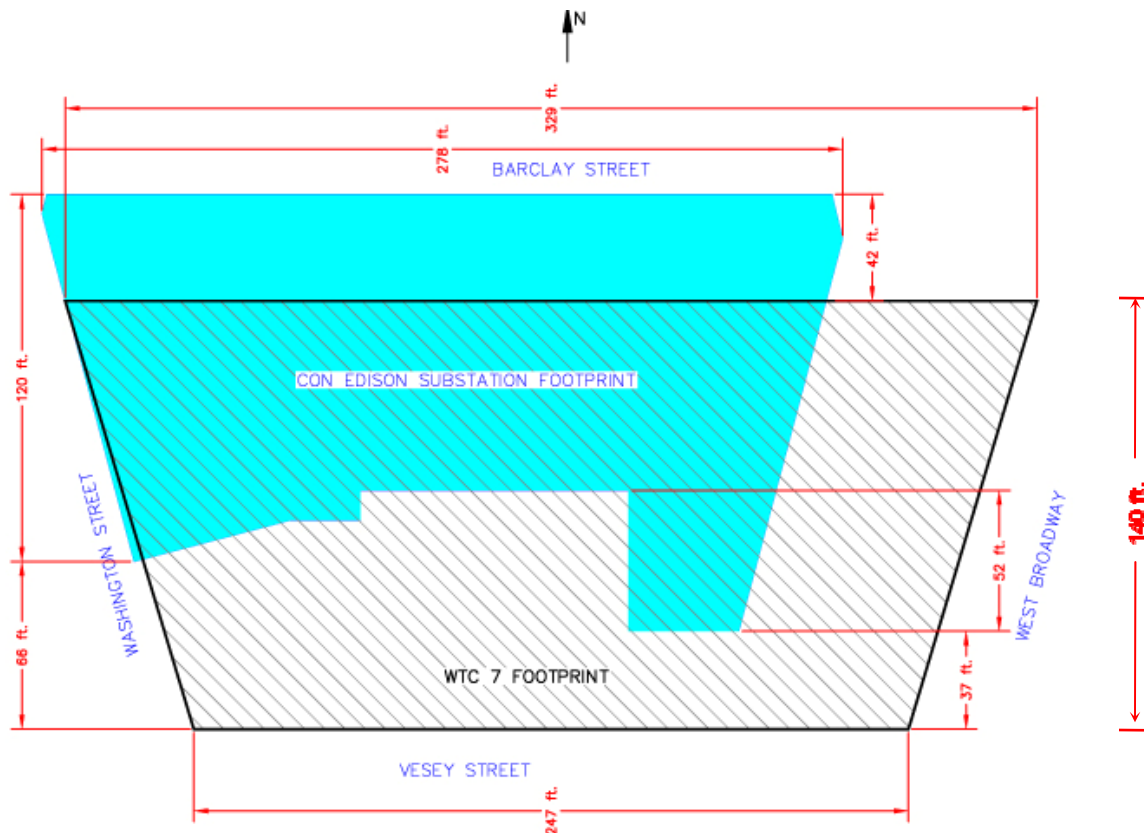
Footprints of the Con Edison substation and WTC 7.
